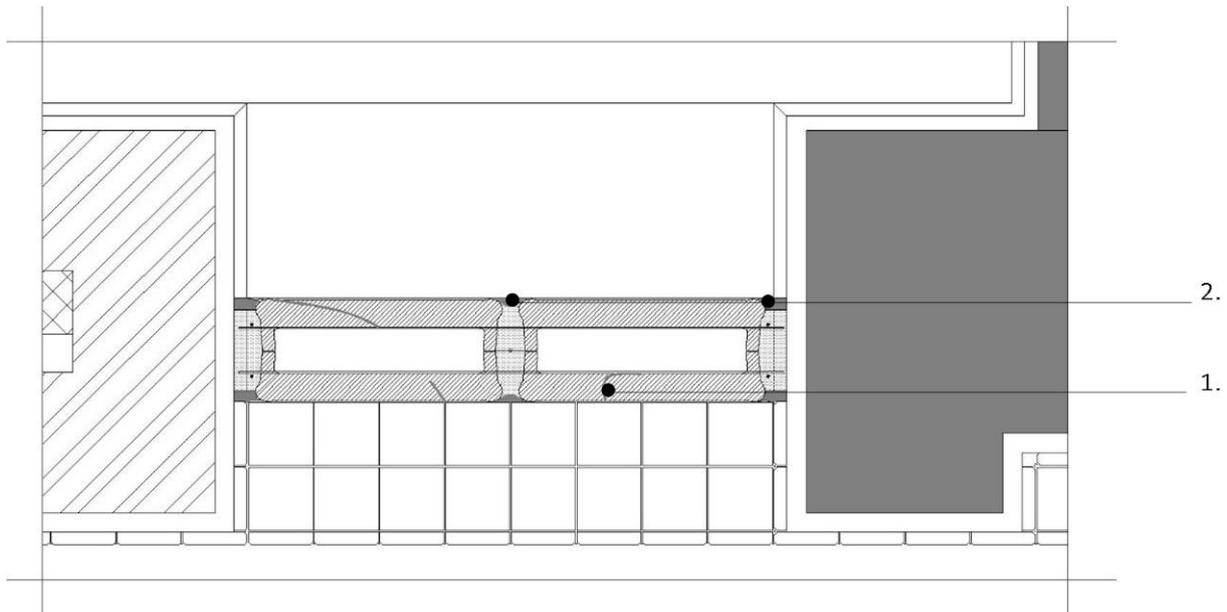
Detailed drawing of the constructive reconstitution of the glass brick windows [3].
